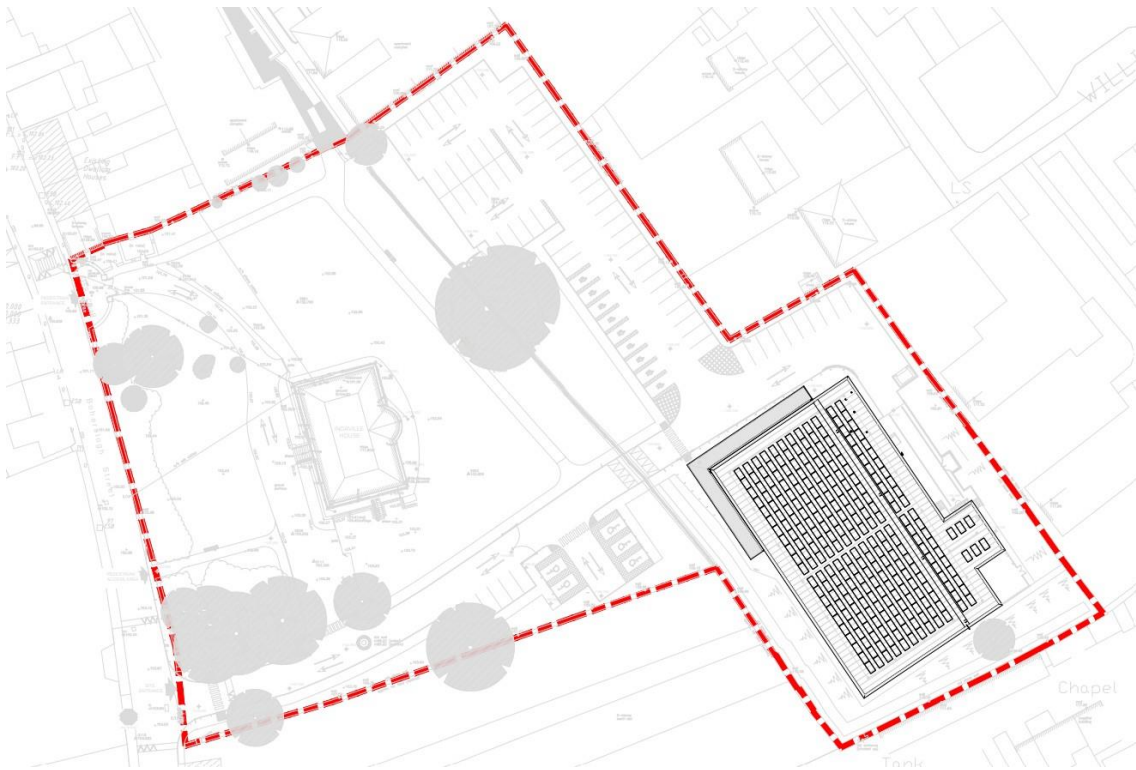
Extract from drawing no. 20984-THPK-17-XX-DR-A-0103 "Proposed Site Layout Plan" showing the proposed site and panel layout.
